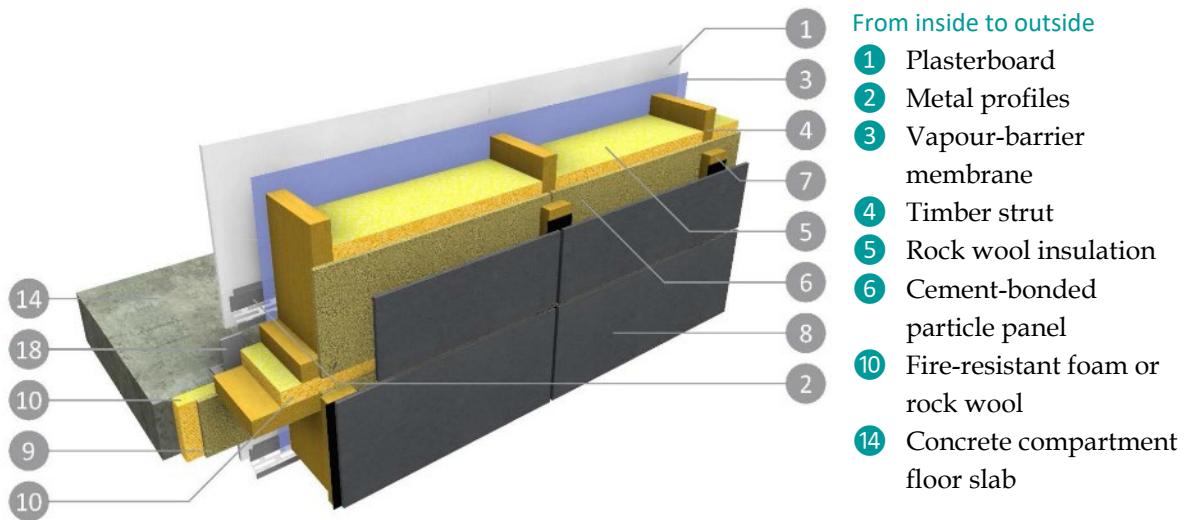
Configurations for E 60 fire-resistant timber facade elements and their junctions with the concrete compartment floor slab (ETEX Group).
